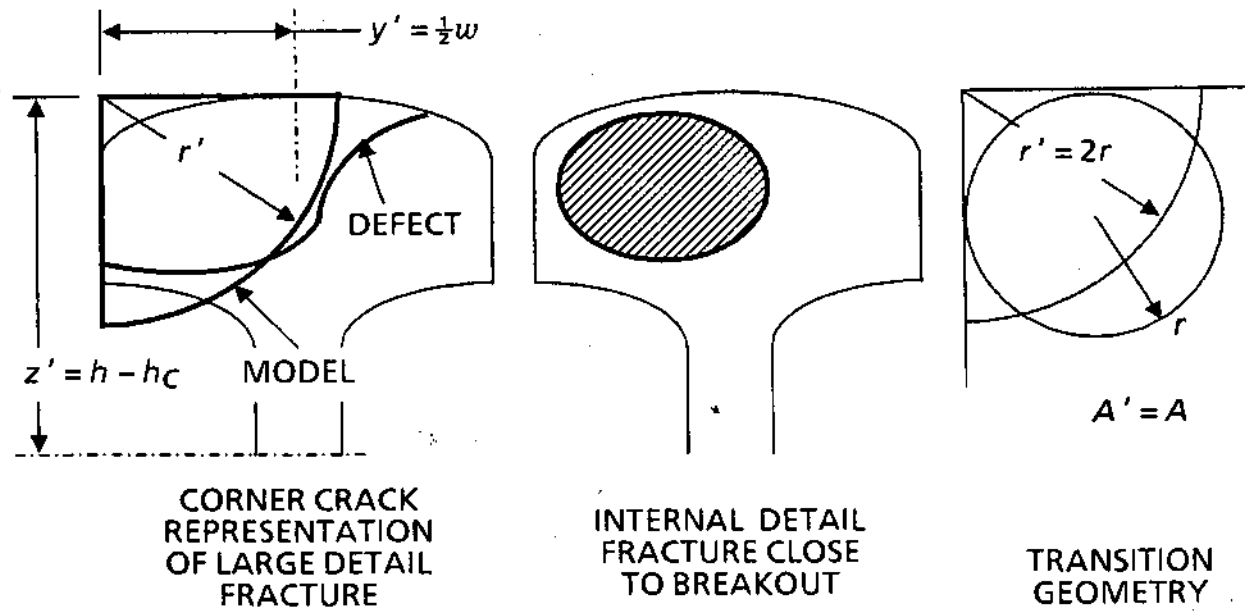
TRANSITION FROM PENNY CRACK TO CORNER CRACK.
